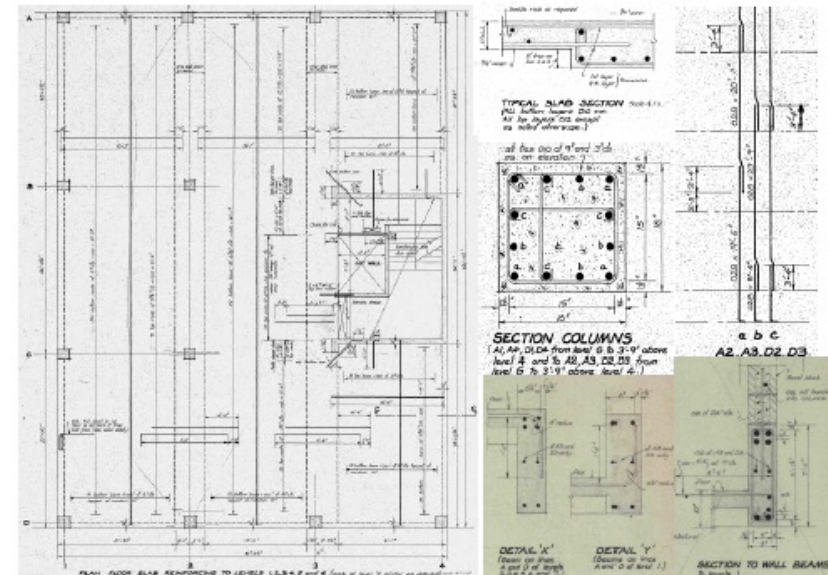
Structural System. Left: typical plan view; right: Column, beam and slab details
